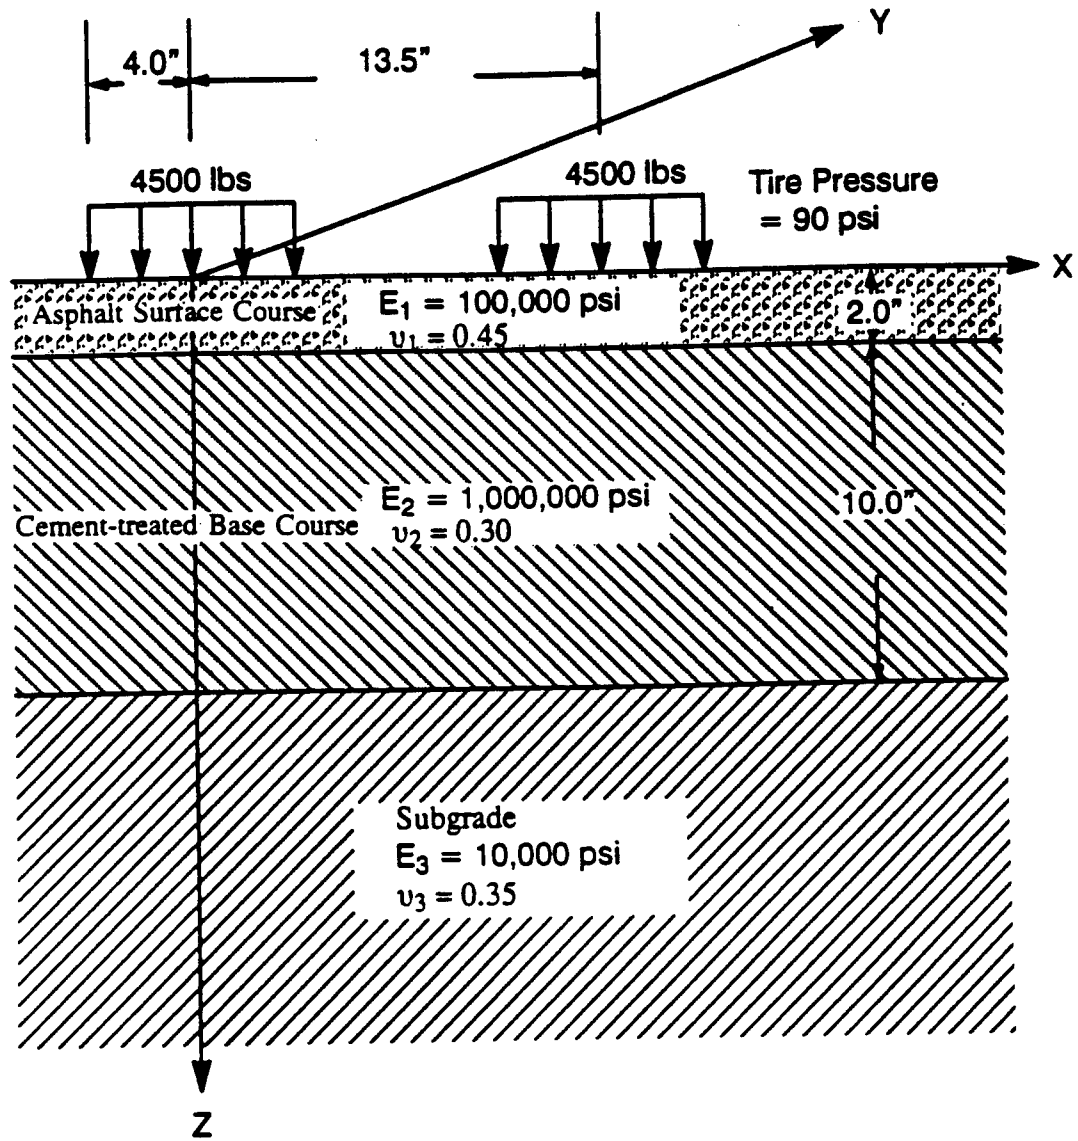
(b) Typical asphalt concrete pavement design type with cement-treated base course.
